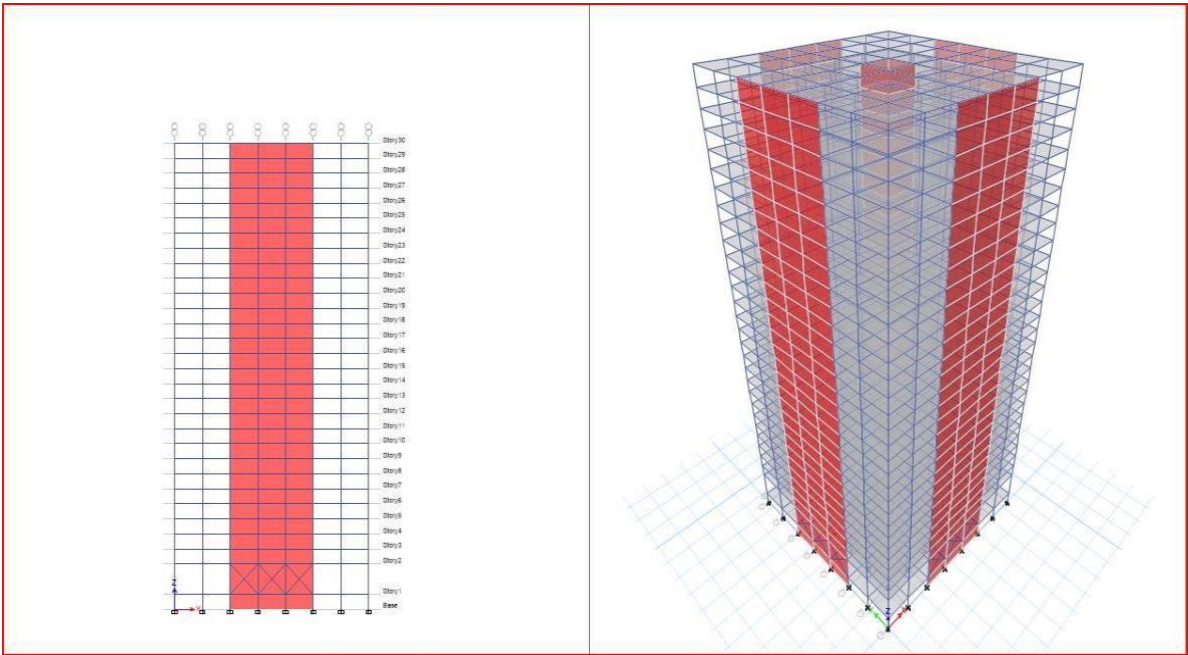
Elevation and 3-D view of Soft Story model with diagonal stiffeners at bottom G+30
